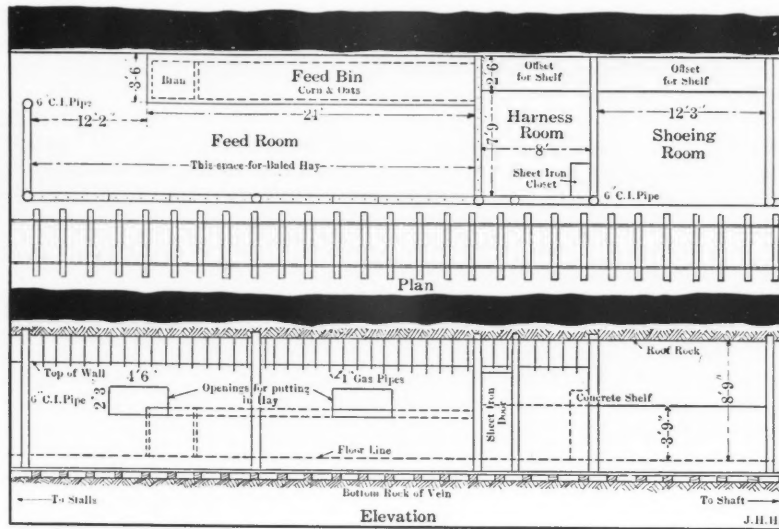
PLAN AND ELEVATION OF SHOEING, FEED AND HARNESS ROOMS
